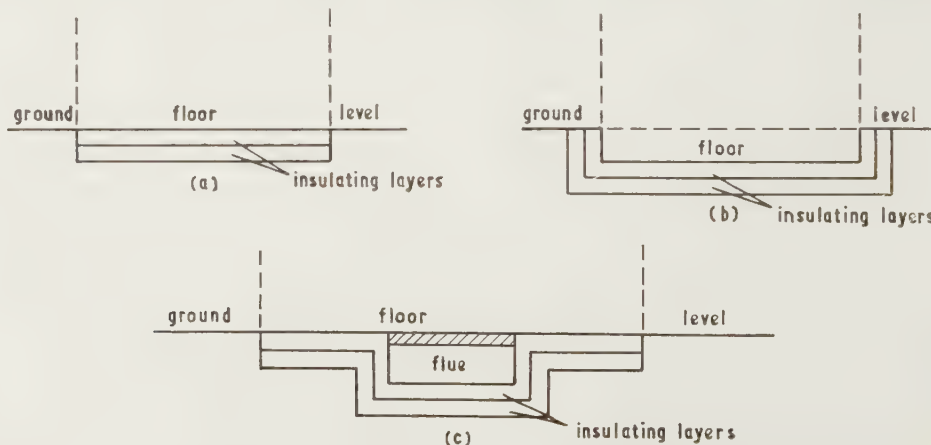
Typical practical floor arrangements with possible insulation layers shown.
